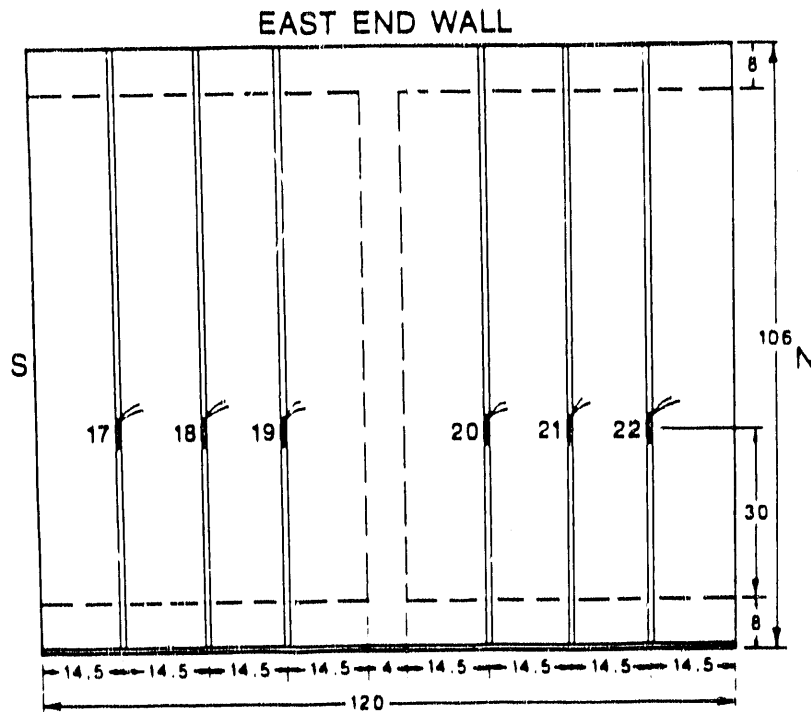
East end wall layer of reinforcement and strain gage locations. (All dimensions are in inches).
